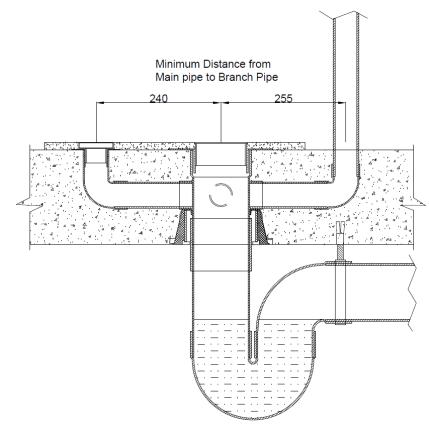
Central pipe in floor waste configuration, four way riser connected to branch floor waste or riser pipes
